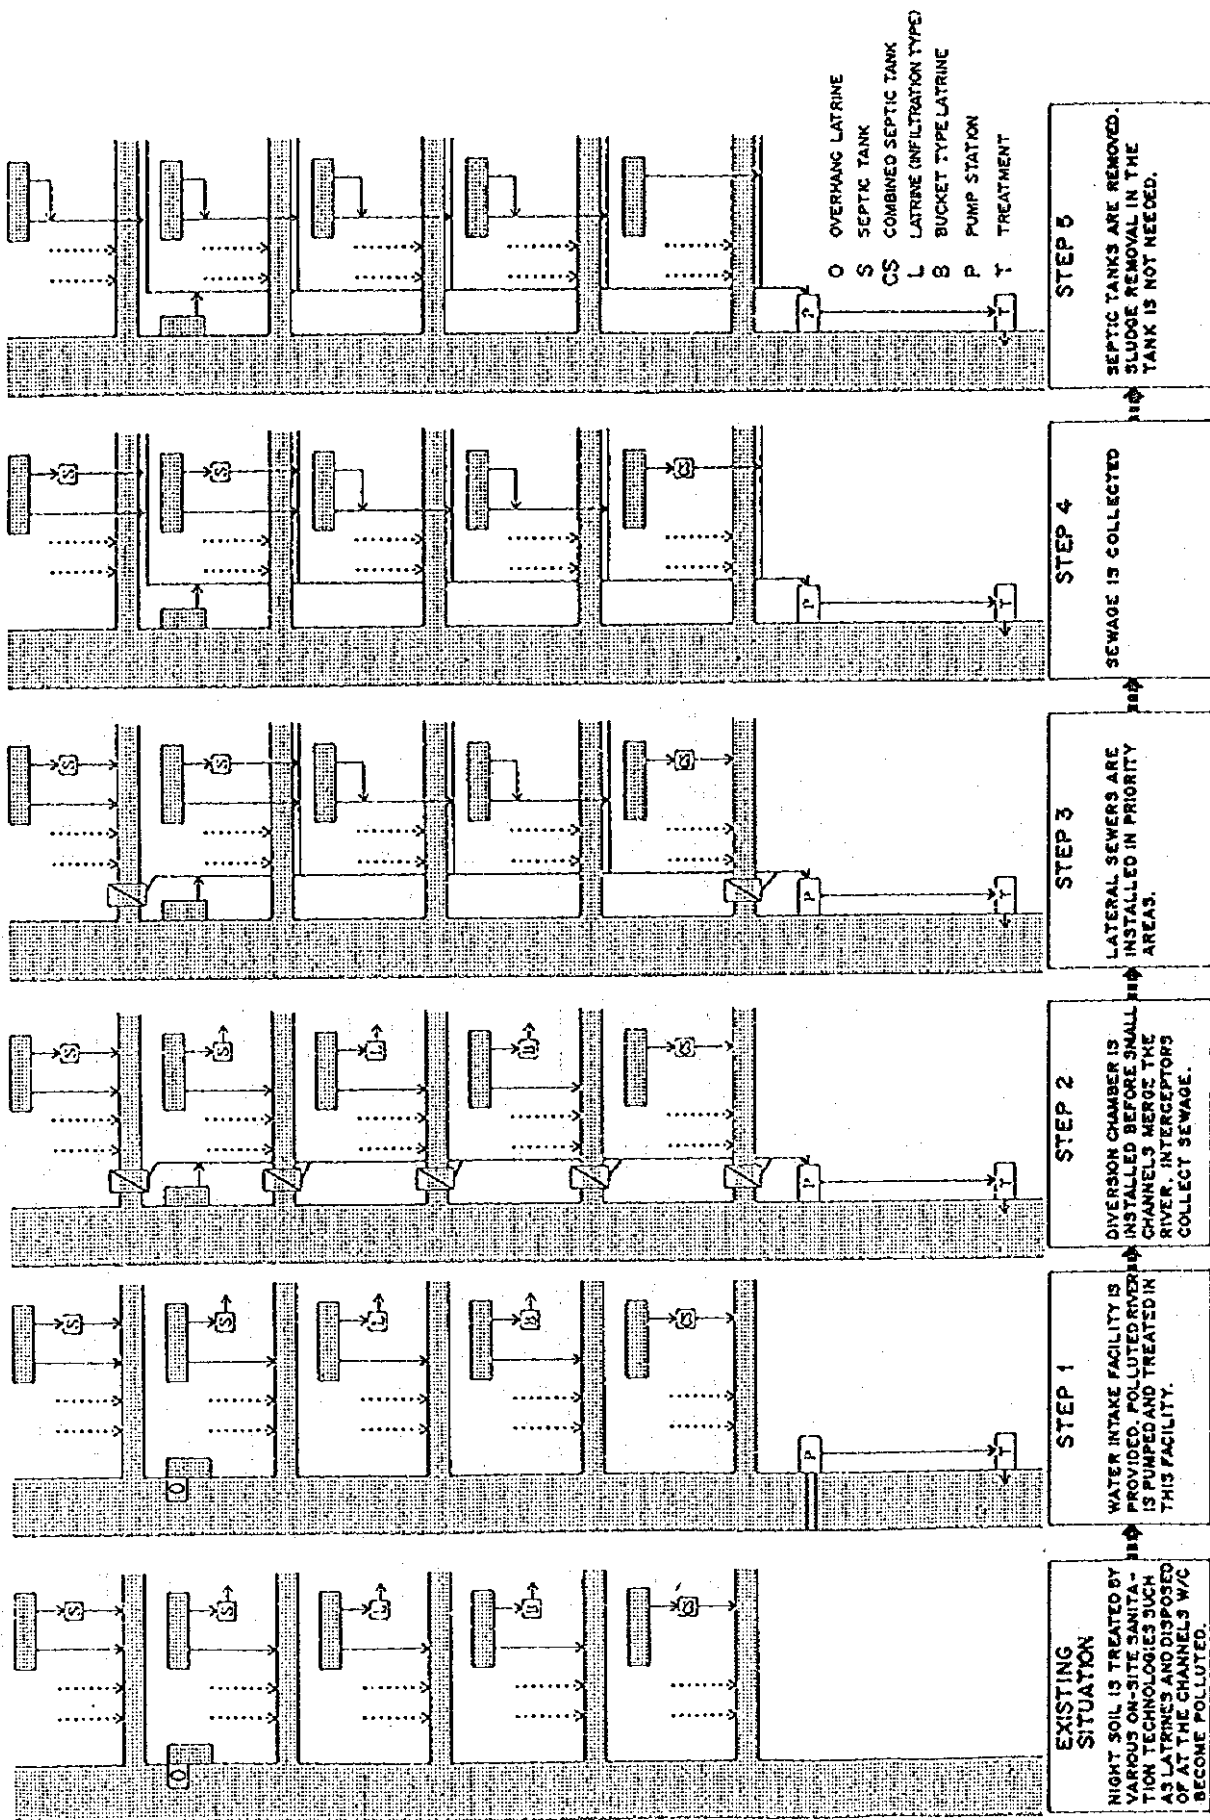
STAGED IMPROVEMENT IN SEWAGE COLLECTION METHOD
